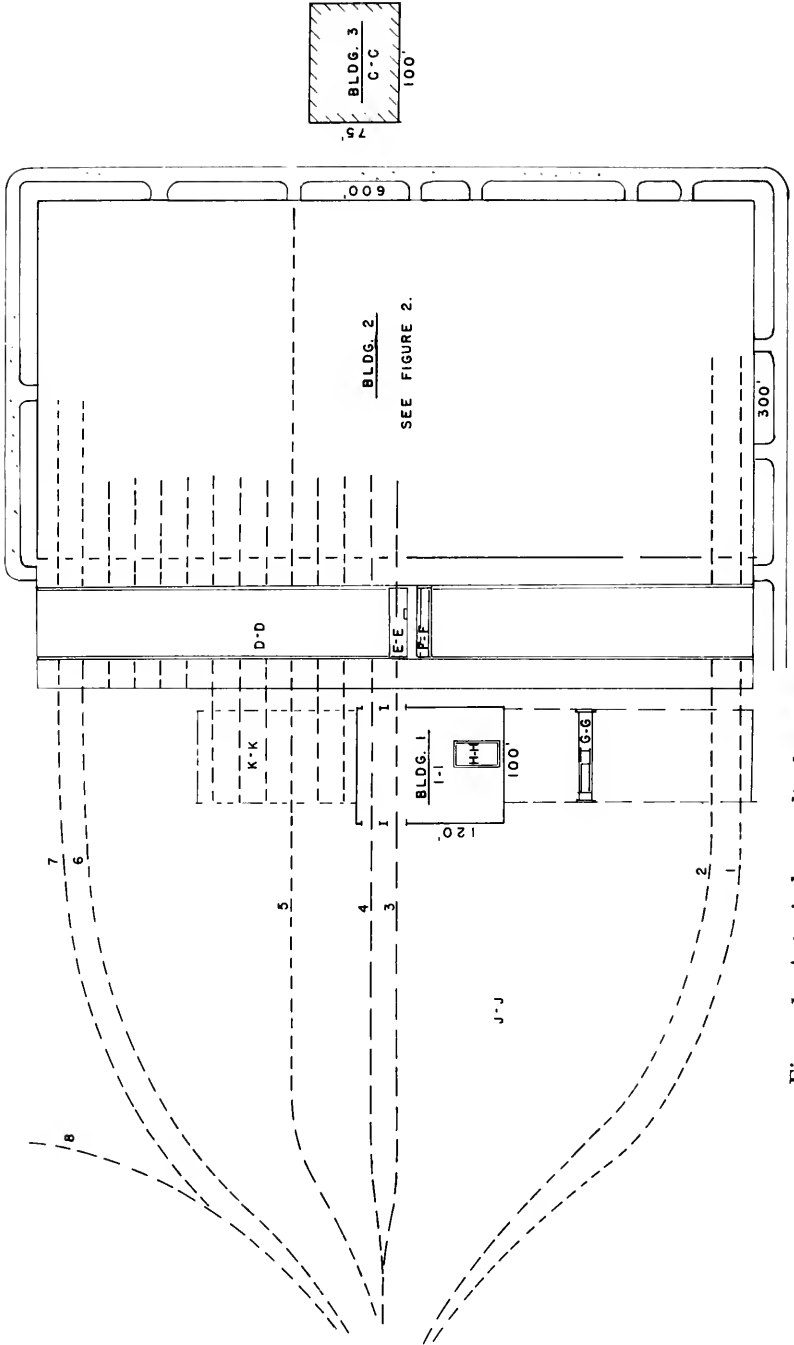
A typical centralized maintenance-of-way equipment repair facility.
